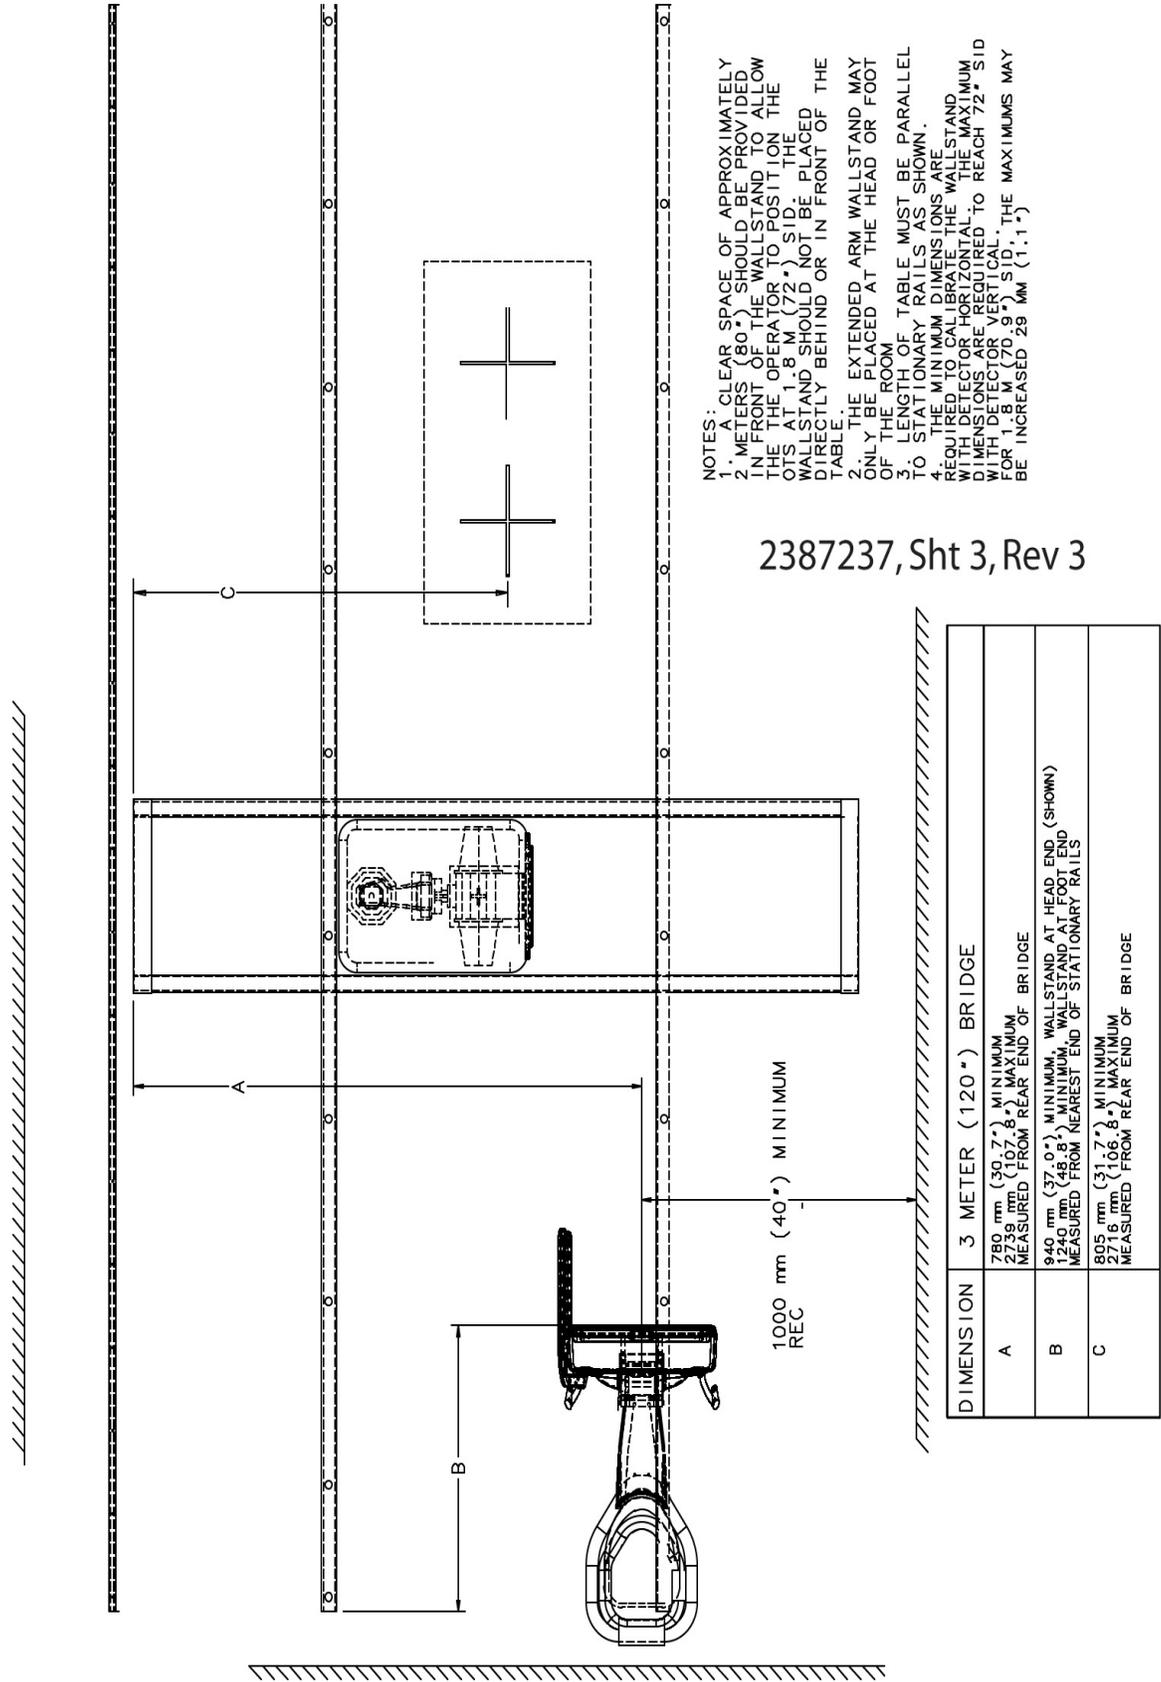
OTS Bridge View for Wall Stand, All Dimensions Minimum Values
